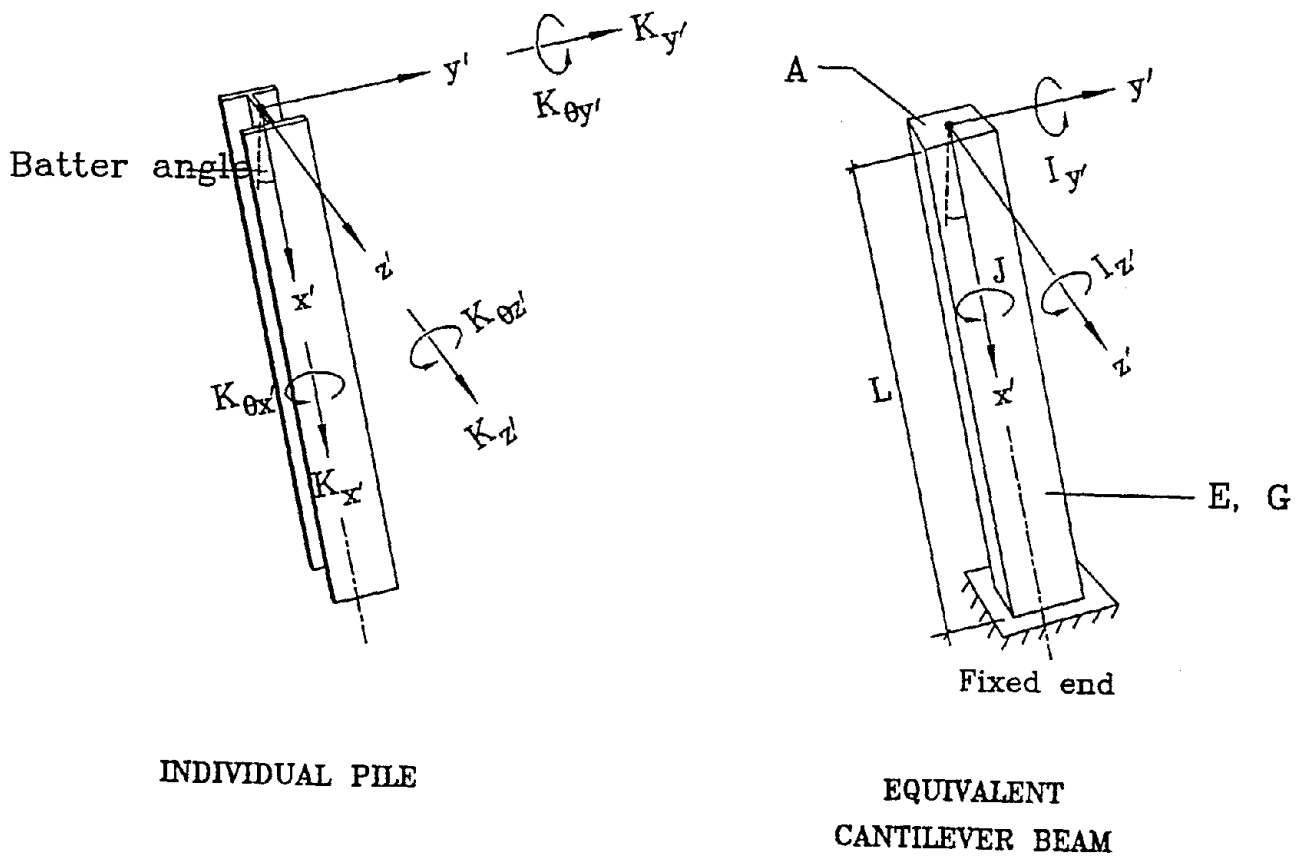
Modeling Piles Using Equivalent Cantilever Beams
